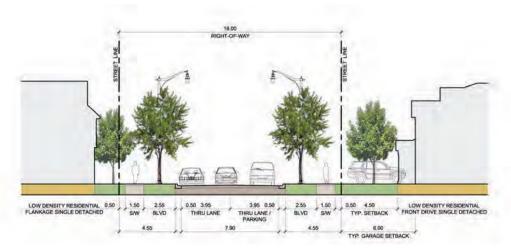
Conceptual typical treatment for Local Roads with 2 thru lanes, sidewalks on both sides, parking on one side and street trees in grass boulevard.
